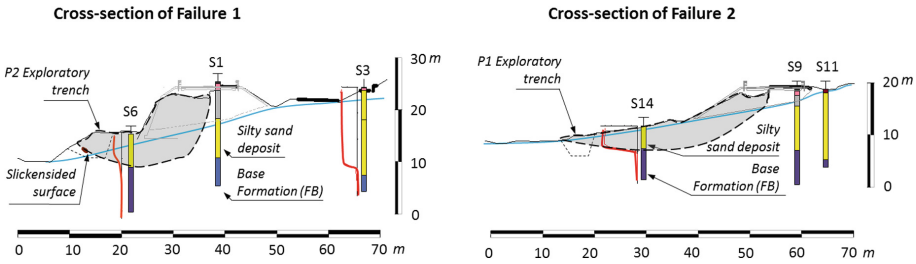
Cross section of Failure 1 (left) and Failure 2 (right).
